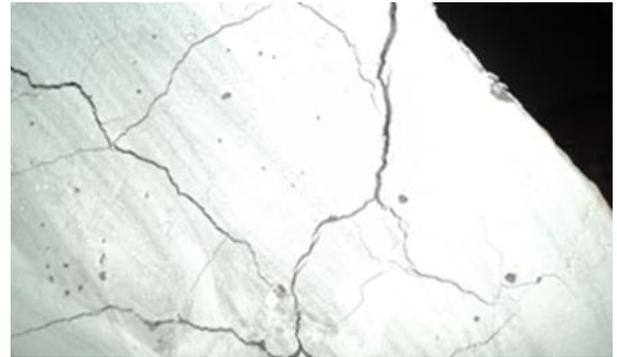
Crack pattern of beam B-2 in centre at bottom layer of tension zone.
